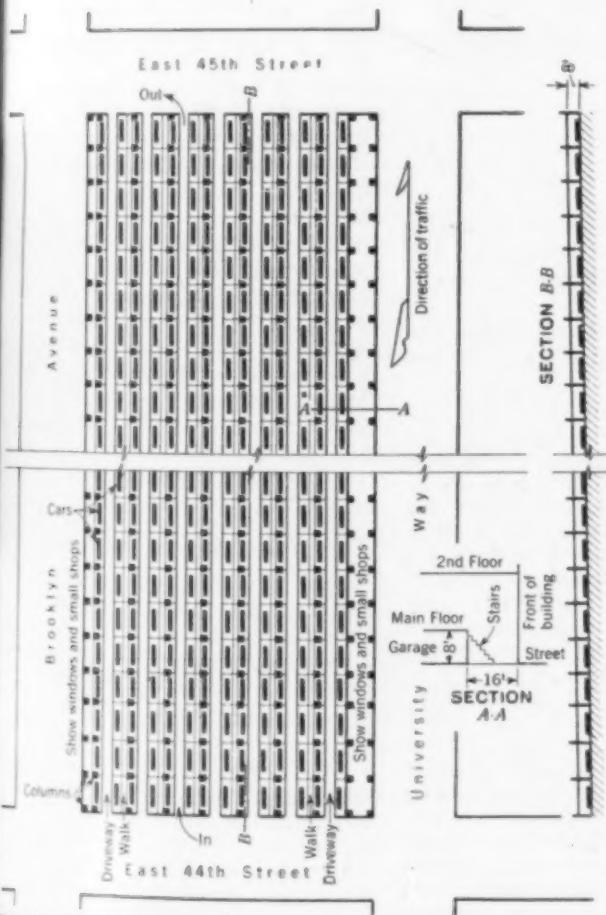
IDEALIZED SKETCH shows ground-floor-level parking system for existing buildings in crowded downtown areas. Single-lane parallel driveways extending full length of city block provide access to parking areas.
